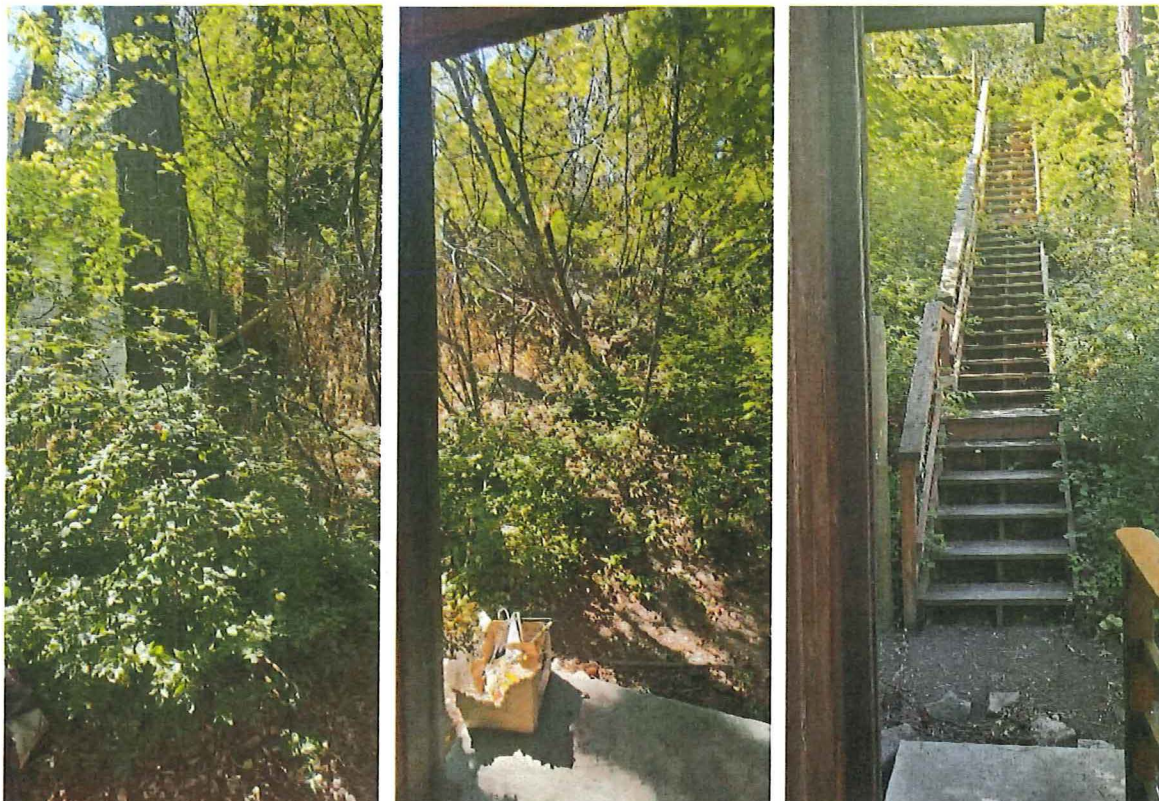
Forested slope above access road, groundwater seep and bedrock outcrops
